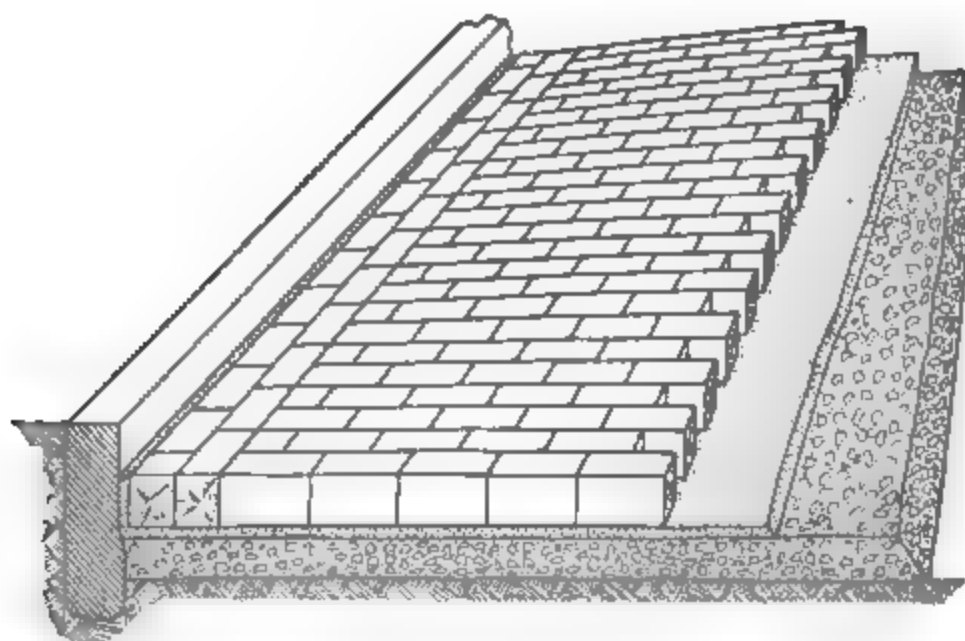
RECTANGULAR WOOD-BLOCK PAVEMENT.
